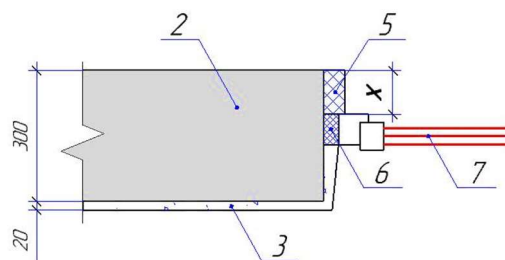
The junction of a metal-plastic window to a precast concrete wall with external jamb insulation
